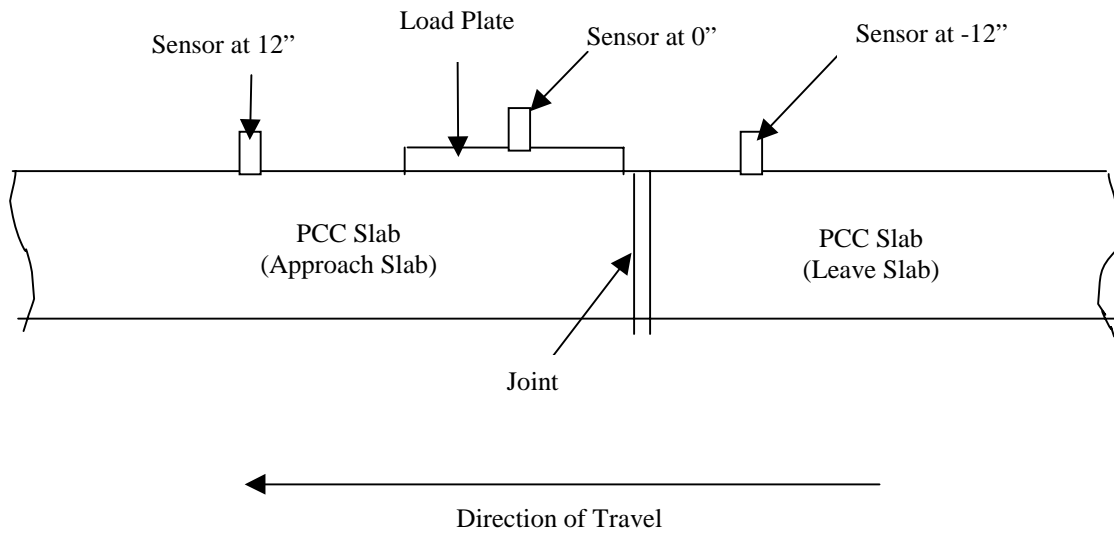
Joint Load Transfer Testing Sensor Spacing ID #3
